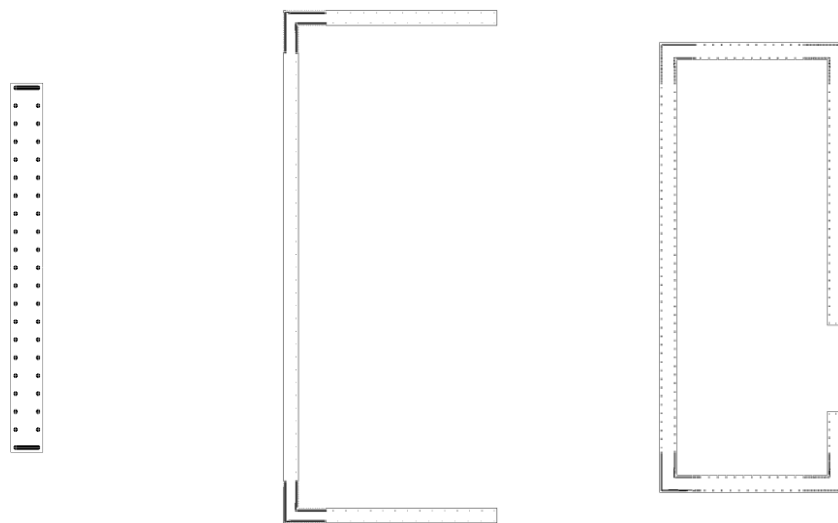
Retrofitted RC cross-sections of the wall buildings
